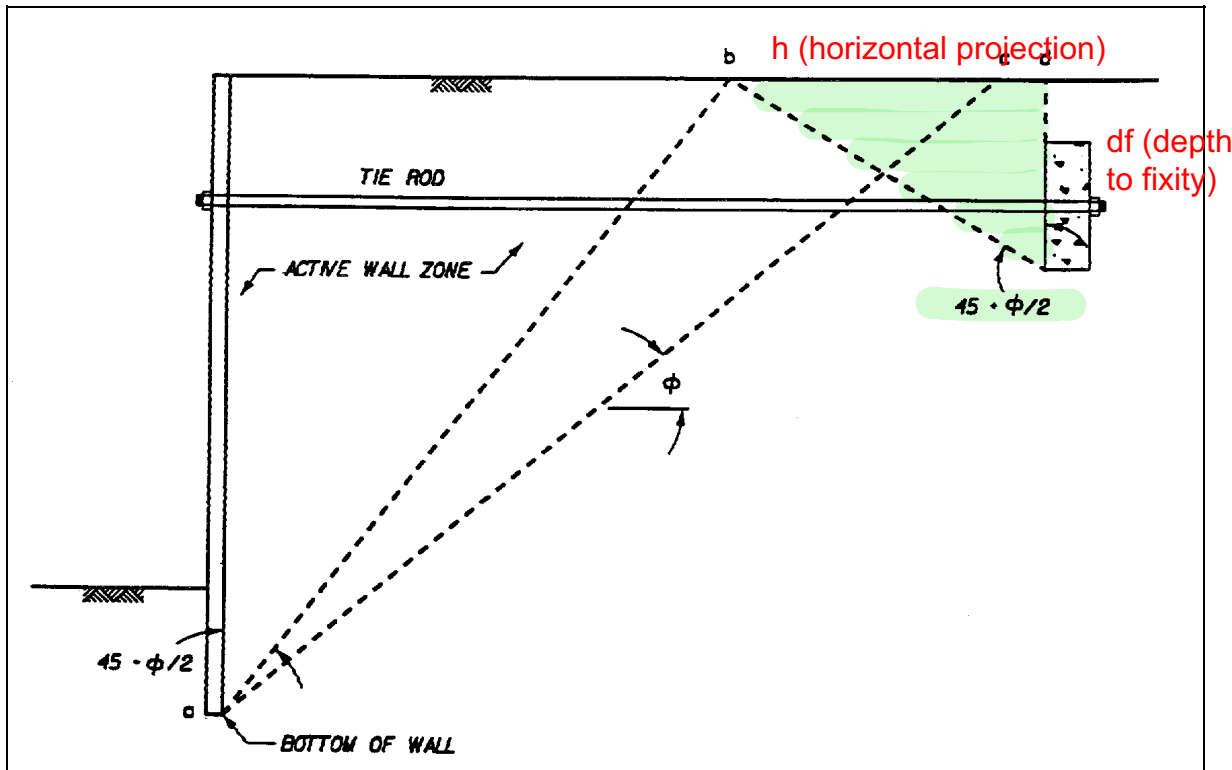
Minimum anchor - wall spacing for full passive anchor resistance in homogeneous soil
